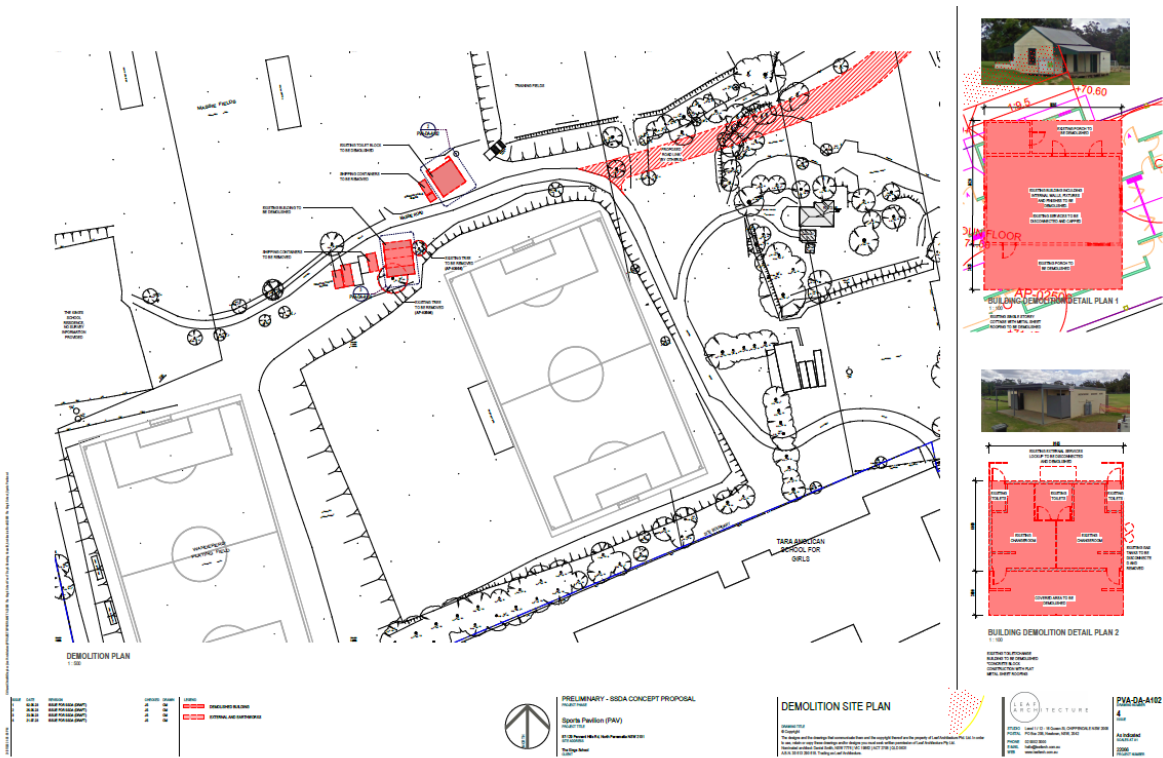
Demolition site plan to facilitate proposed concept for the Sports Pavilion.
